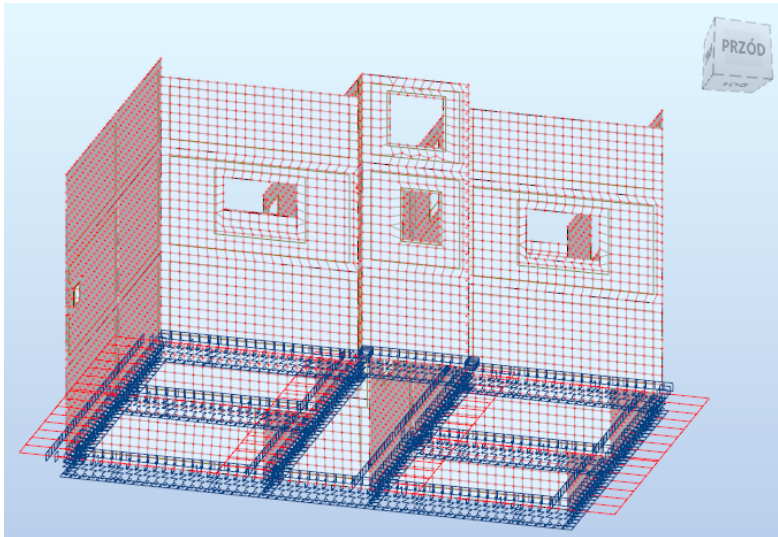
FEM calculation model of building #3 with the applied tangential stresses at the foundation level
